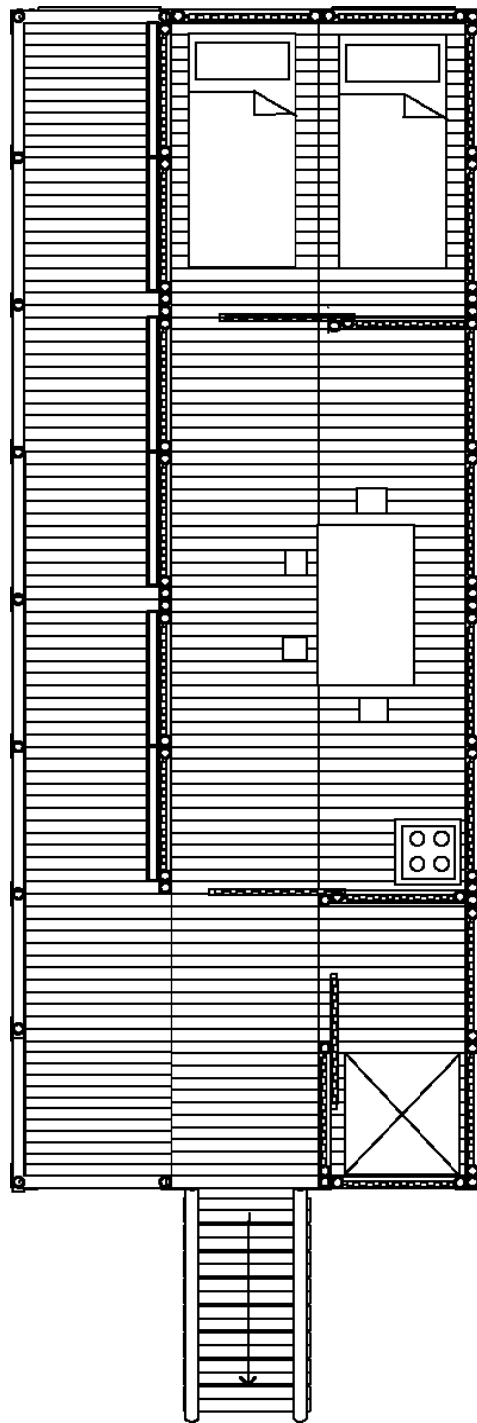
Housing Unit Floor Plan (Not to scale).
